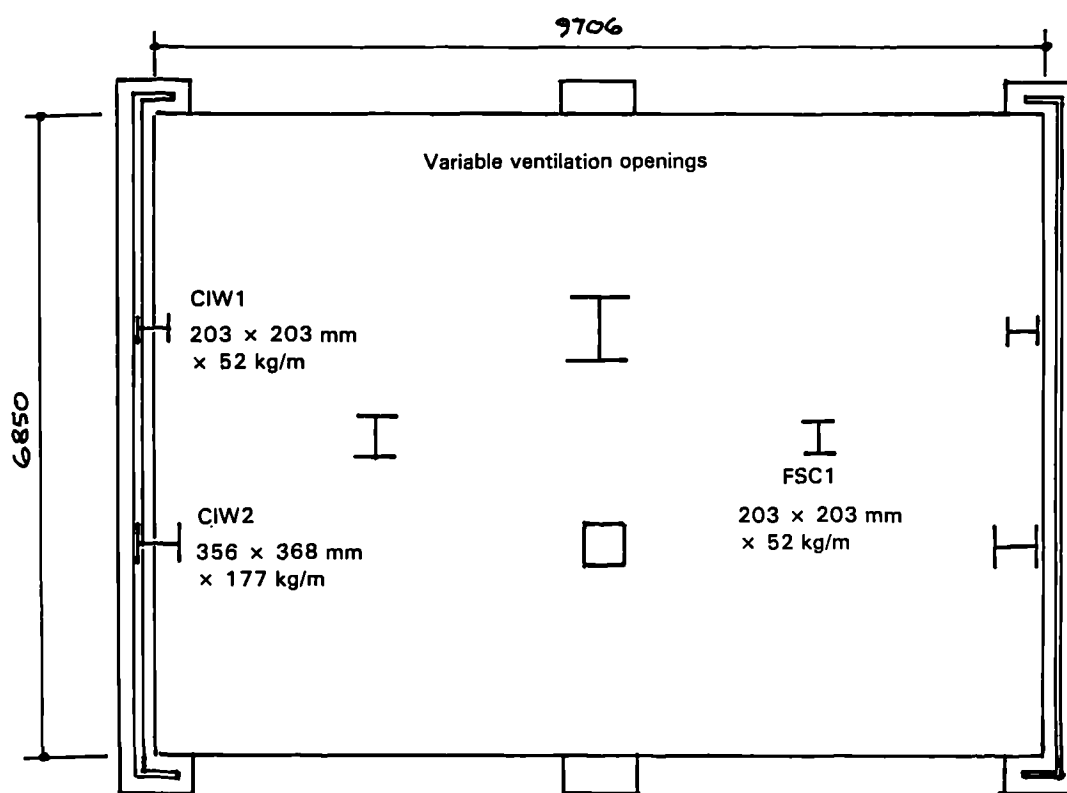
Plan of Cardington test rig showing positions of columns
